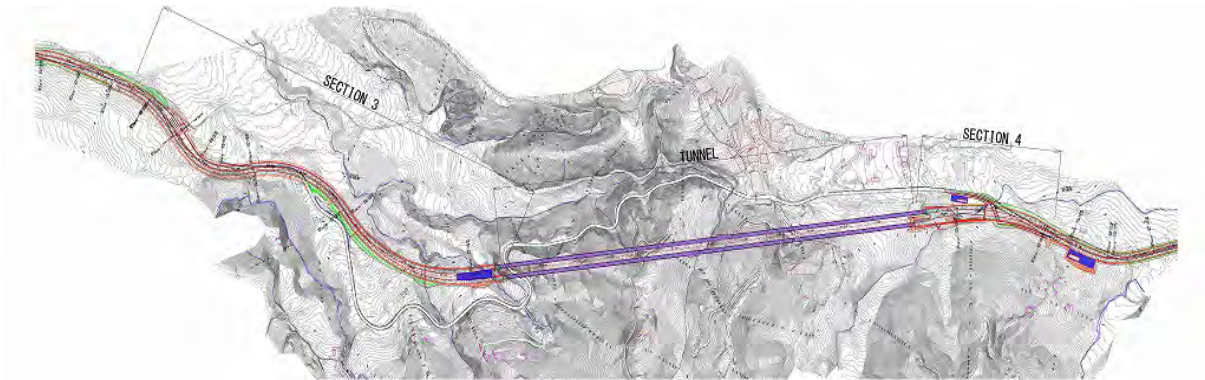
Plan of Section 3, Tunnel and Section 4
